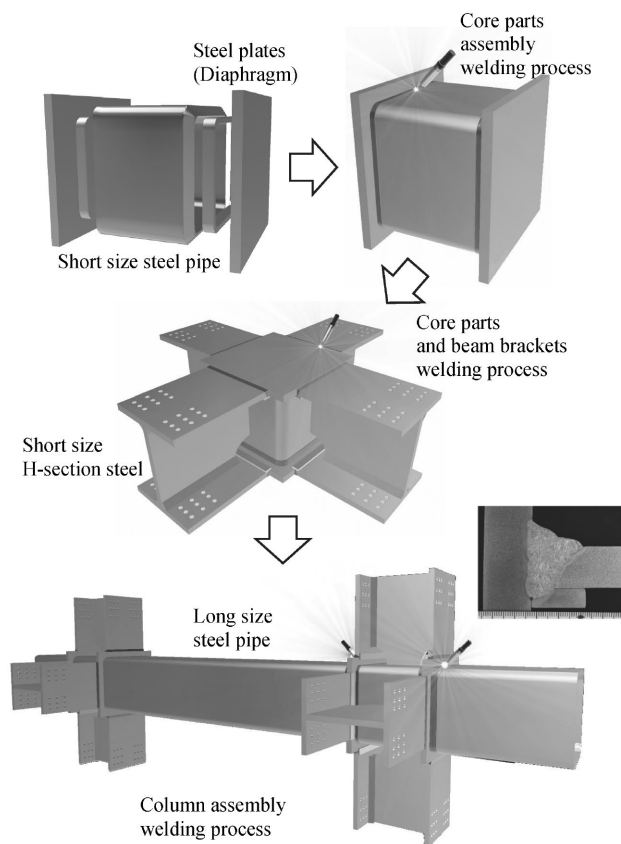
Typical welding assembly process of continuous-beam type column and an example cross-section of a weld joint
